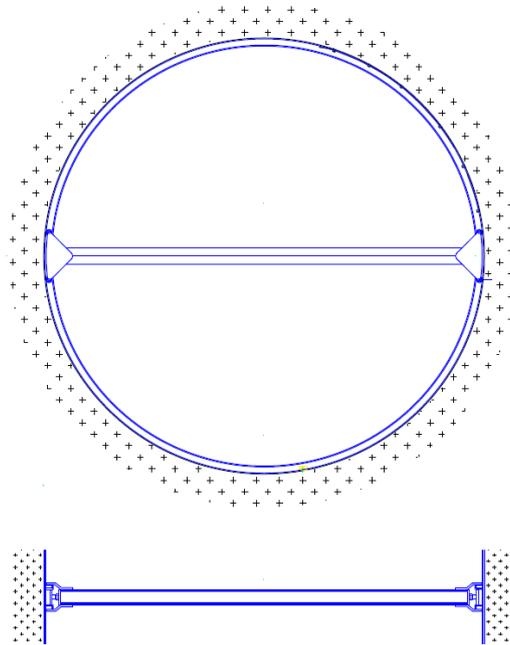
Basic layout of the device proposed for supplementing the drilling and tube pushing.
